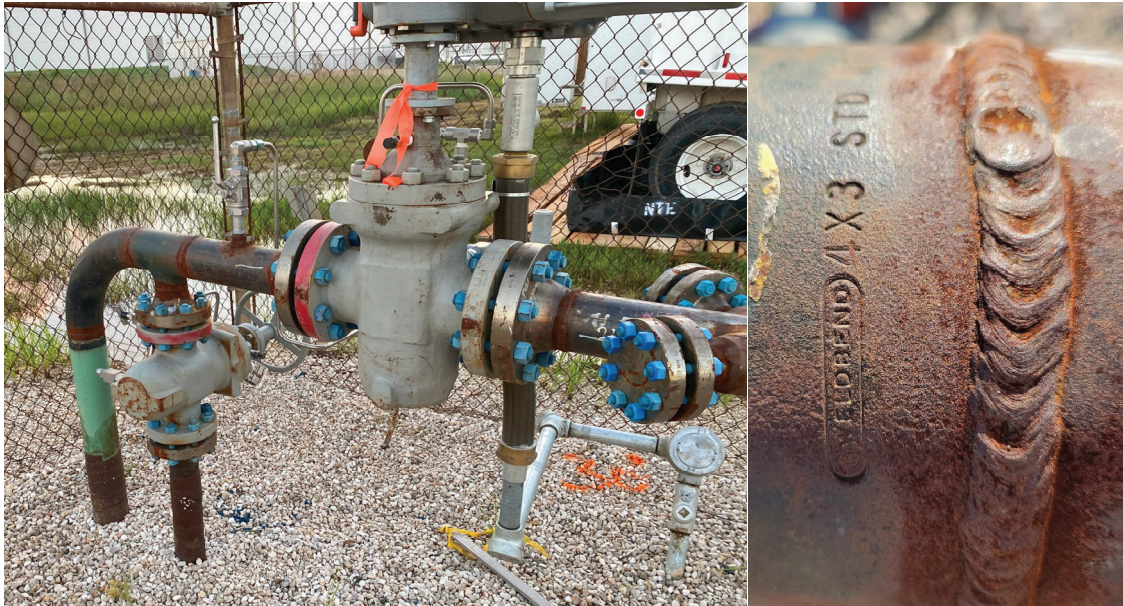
New 4" launcher constructed for an ILI, with a standard wall tee.
